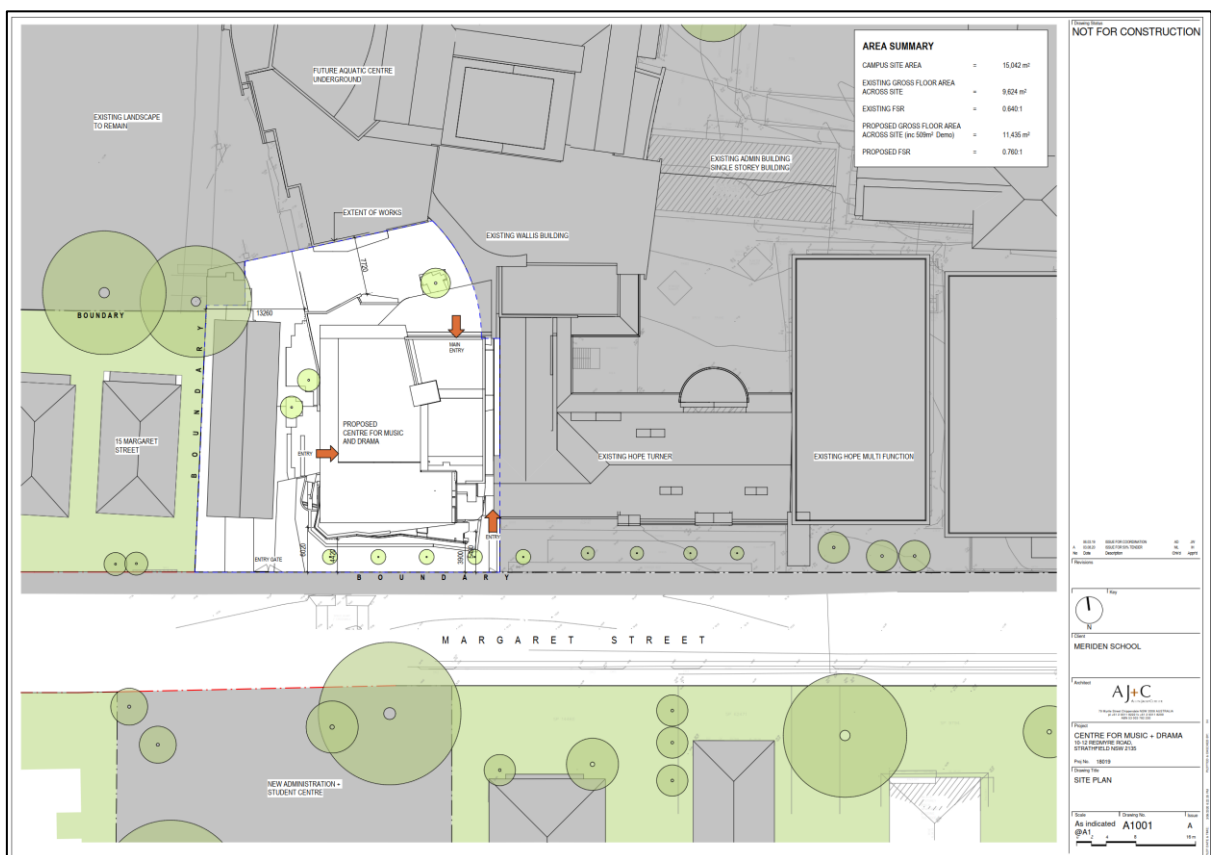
Senior Campus Centre for Music and Drama Layout (Site Plan)
